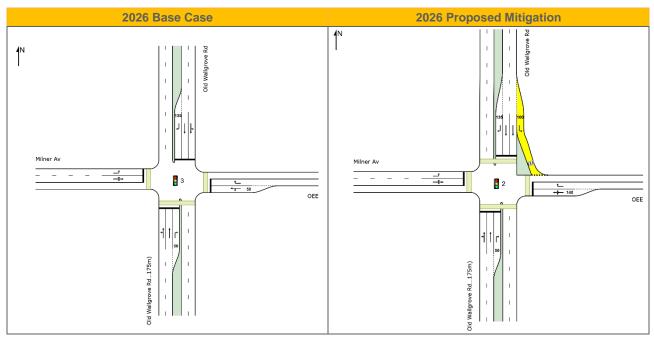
Old Wallgrove Road / Millner Avenue intersection Mitigation
